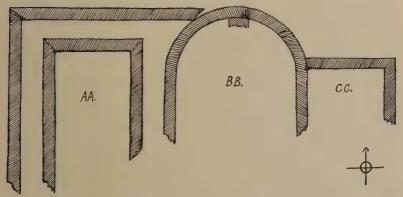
STATION VILLA. ROOMS AA, BB, CC, PLAN.
